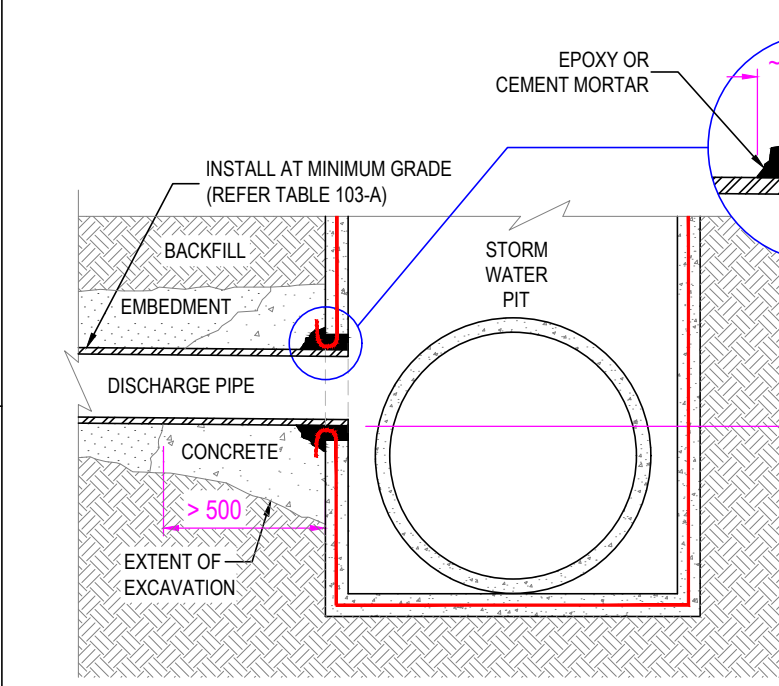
G: SEWER OVERFLOW TO STORM WATER PIT CONNECTION
